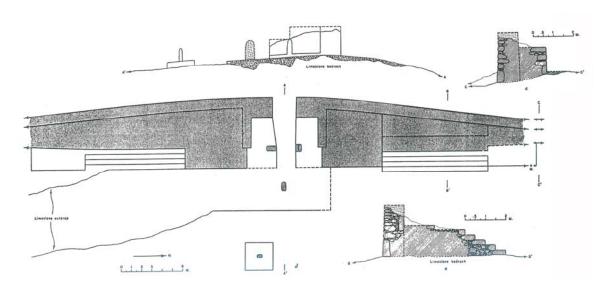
Plan and cross section drawings of Gate O (modified after Shook 1952:Figures 3c-3e).
